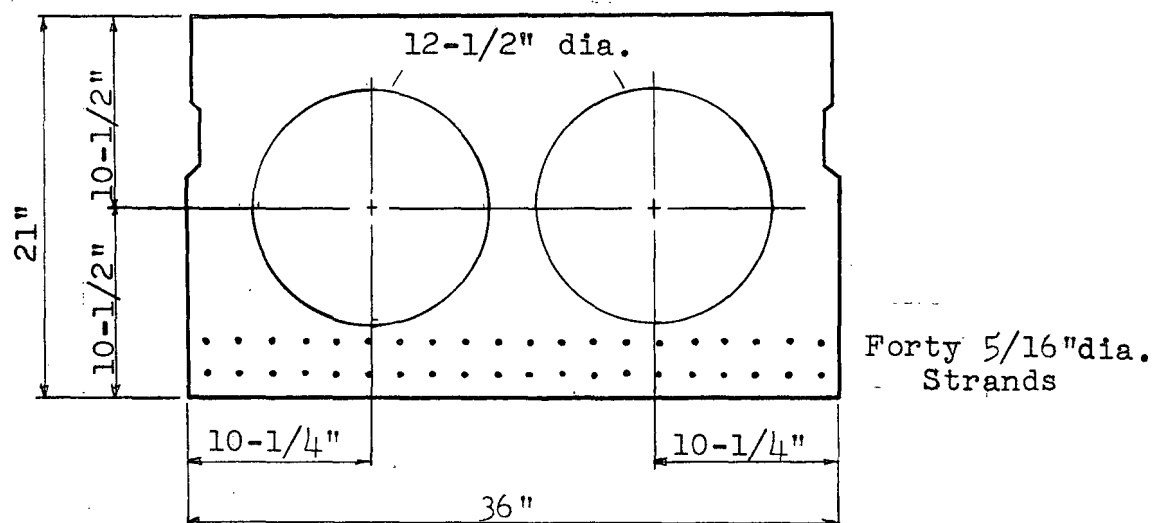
CROSS SECTION OF 38-FT. SPAN PRETENSIONED MEMBER
